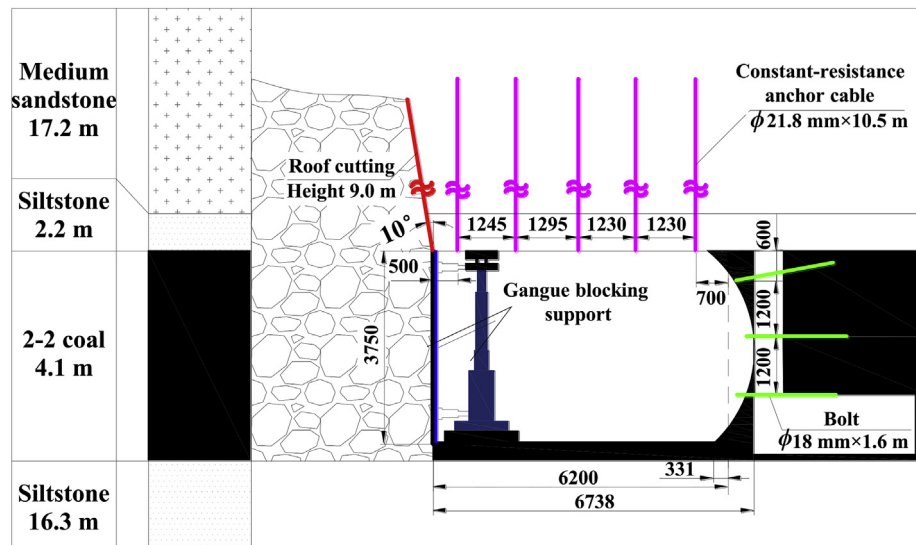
Parameters of roadway roof cutting and support of the 1G N00 mining method (unit: mm) (He and Wang, 2016).
